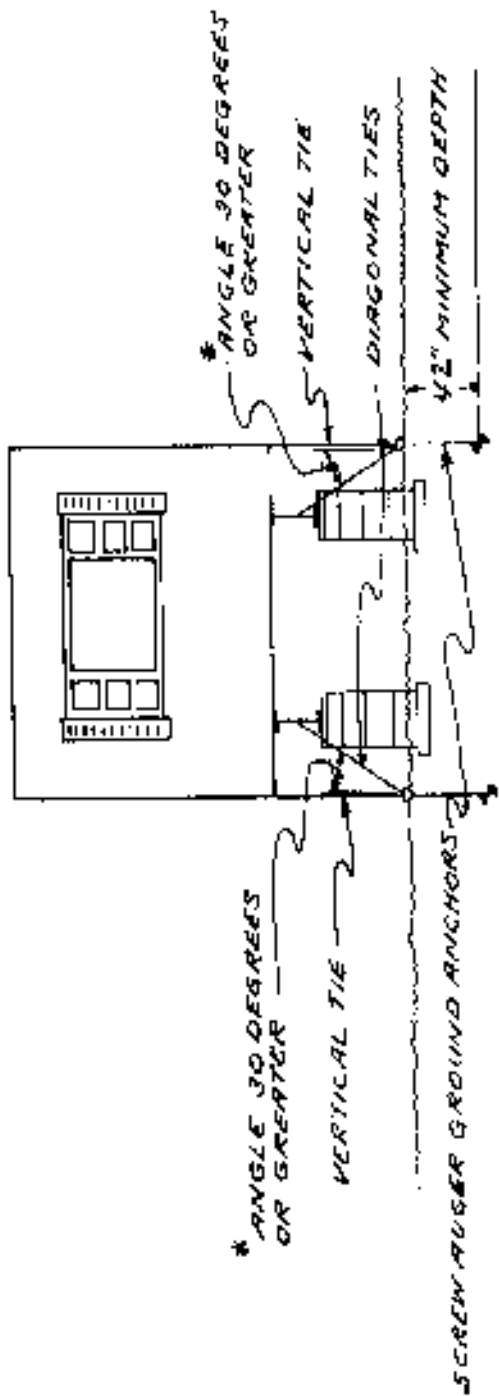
PIERS OVER 60" IN HEIGHT (DOUBLE BLOCK CONSTRUCTION, STEEL REINFORCED)
